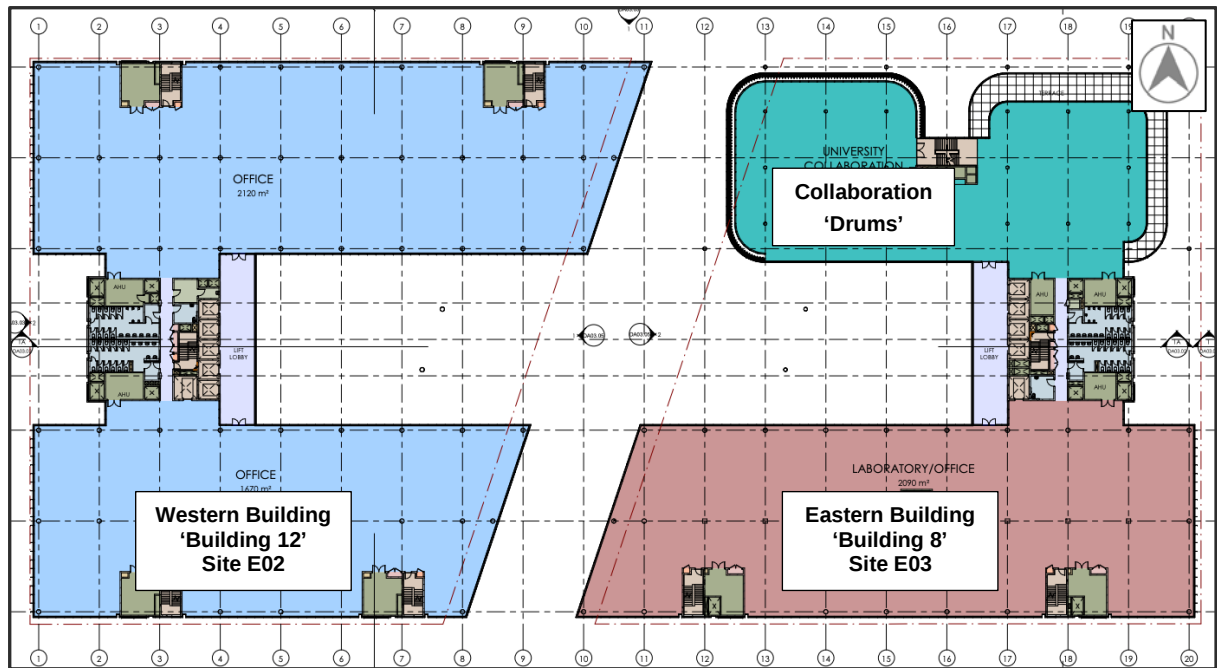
| Level 5 floor plan indicating typical floor plan arrangements (Base source: EIS)
